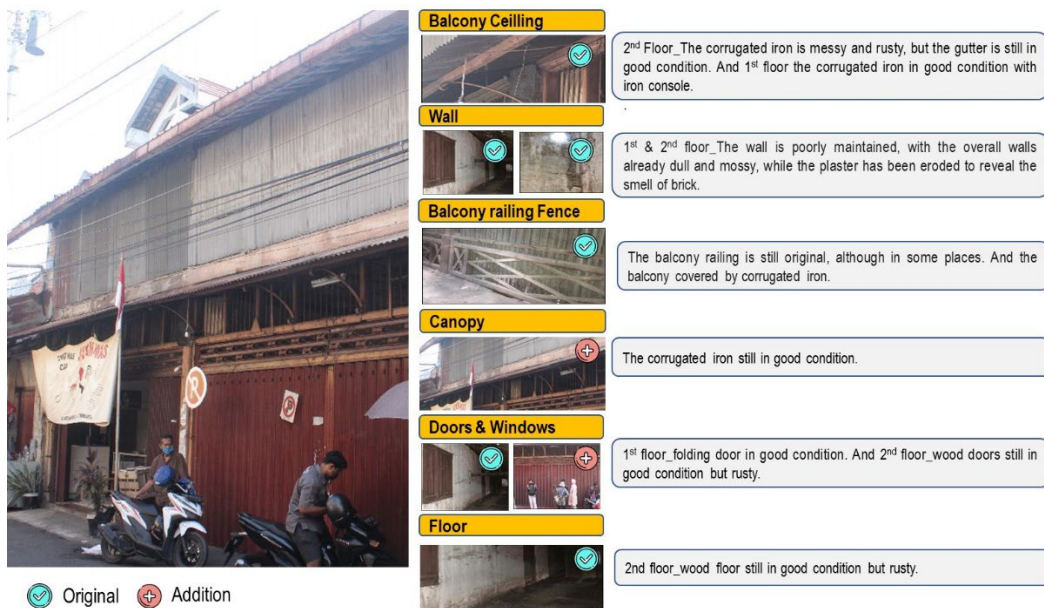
Identification of Facade Damage of the Ketandan 5 and 7 Shop House
